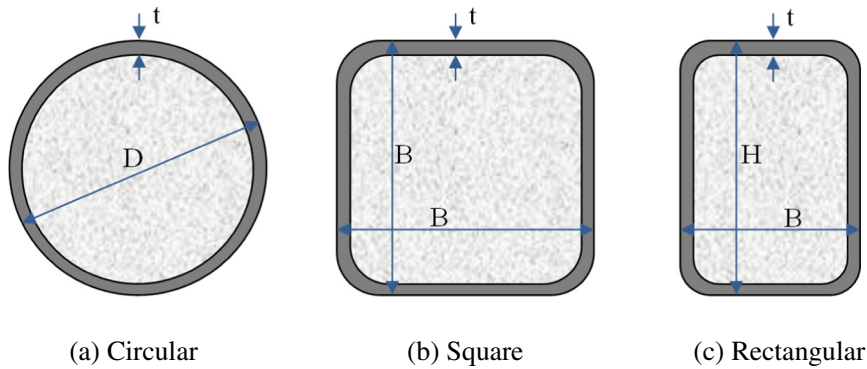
Concrete-filled steel tubular (CFT) columns.
